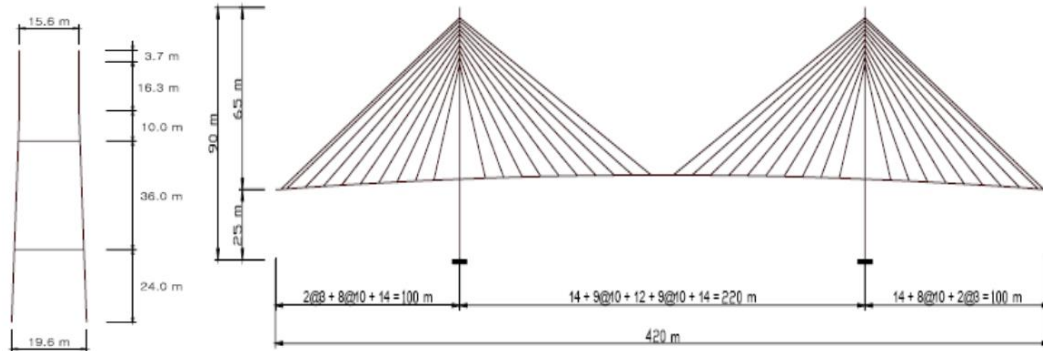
The layout of the bridge and tower (Vikas et al., 2013)
